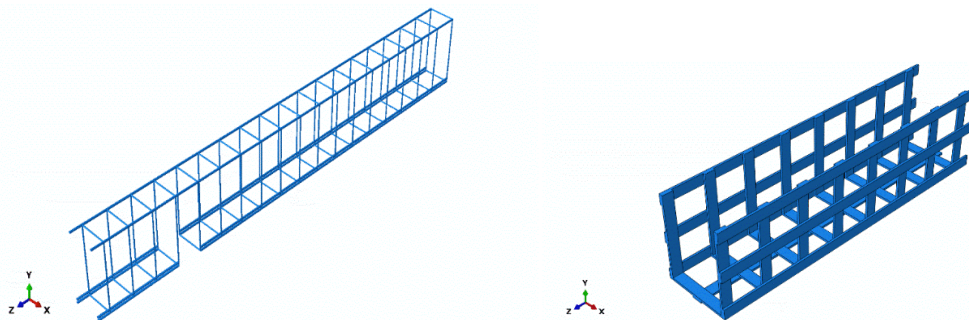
Steel Reinforcement Cage and Steel Jacket.
